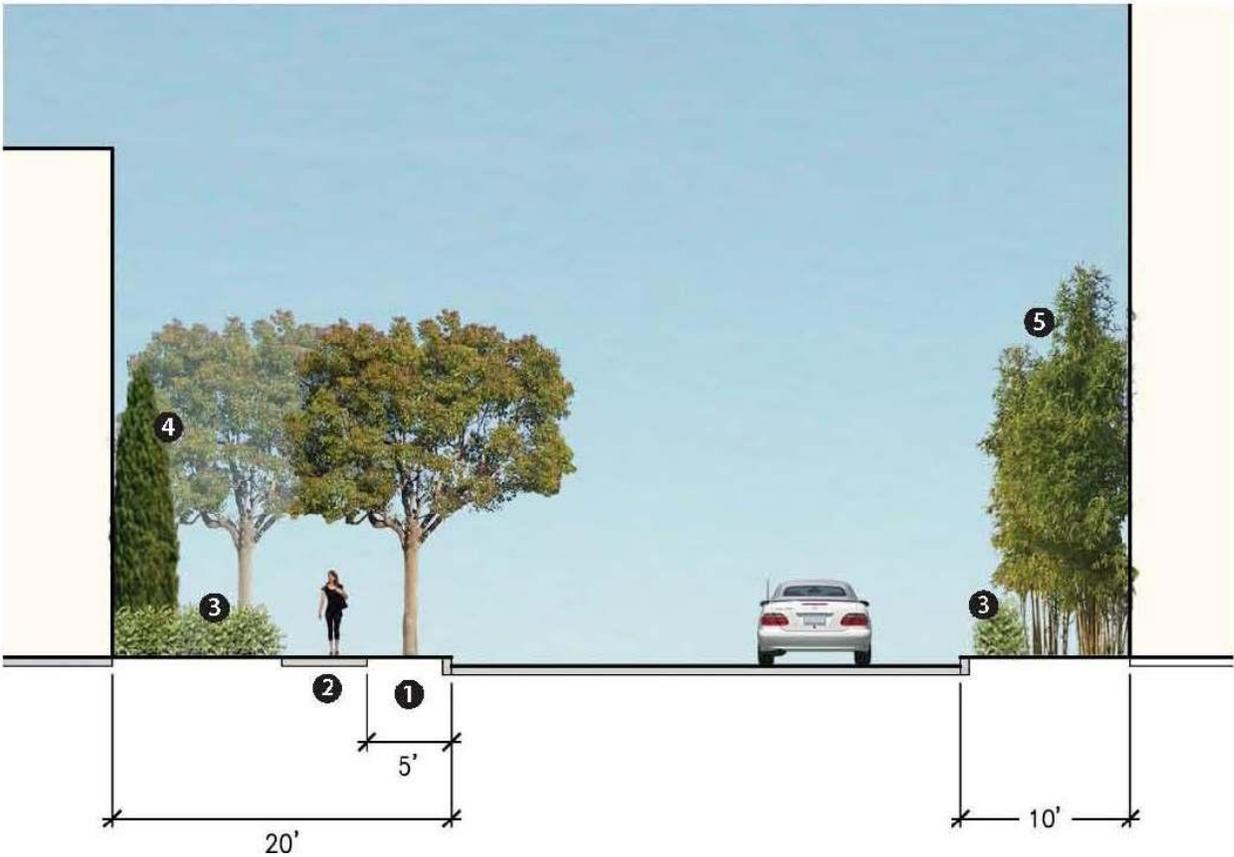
Minor Retail Tenant Parking Lot to Pad Entry
